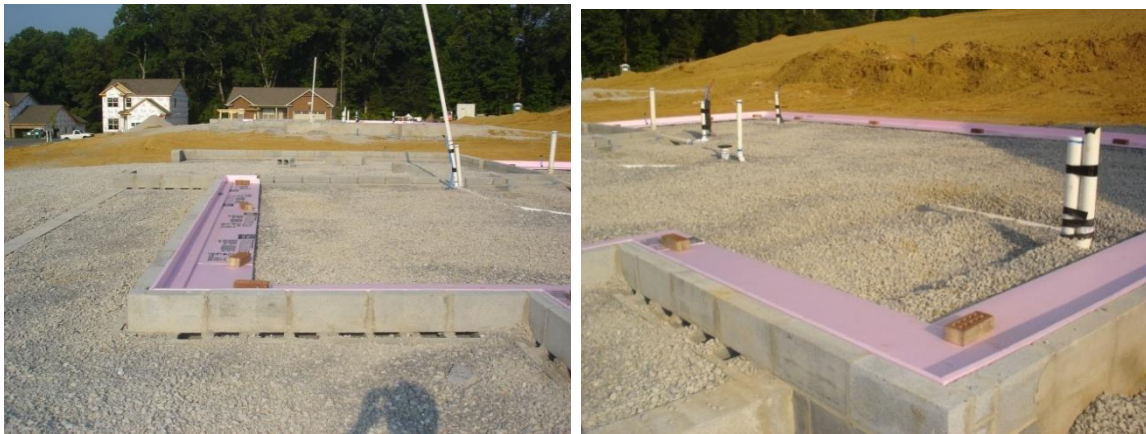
Extruded polystyrene placed along exterior foundation/slab.
